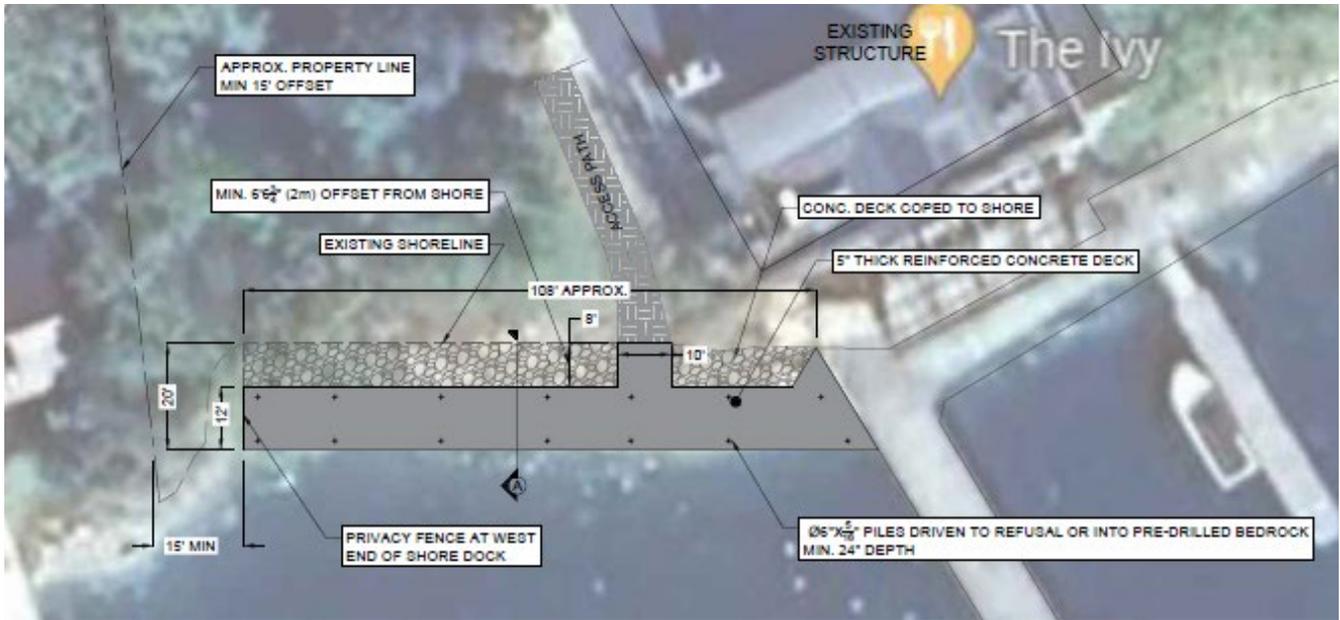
Concept Plan (Source: Kehoe Marine Construction Ltd.)
